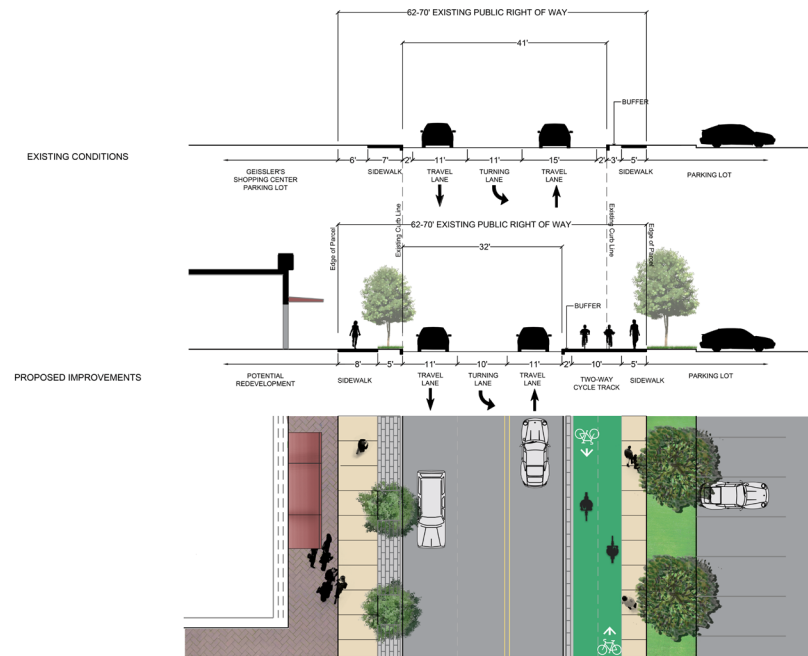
PROPOSED BRIDGE STREET CROSS-SECTION SECTION A: LOOKING EAST (AS IDENTIFIED IN FIGURE 22)
